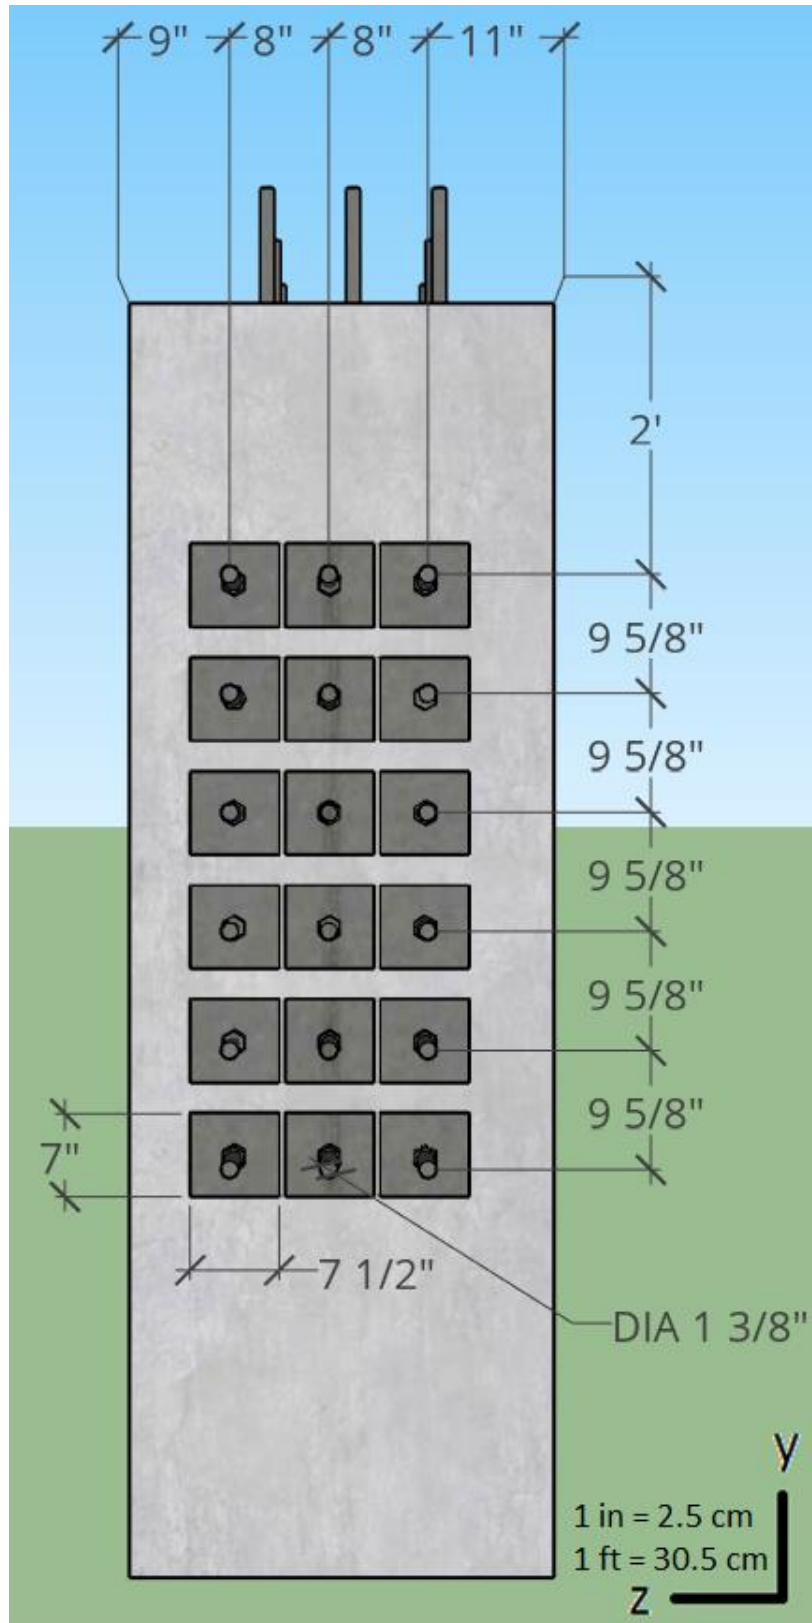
Specimen 2- Post-Tension Bar Layout Side View
